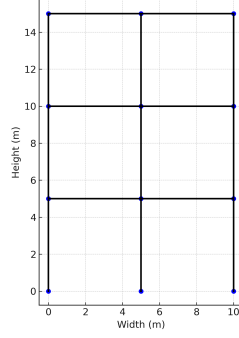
2D frame building model with 3 floors and 2 spans
